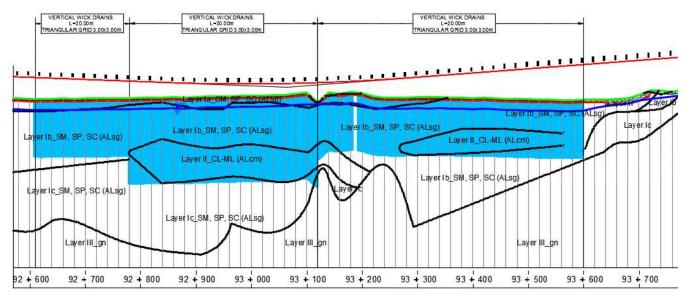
Longitudinal section of the embankment with the proposed installation of vertical drains.
